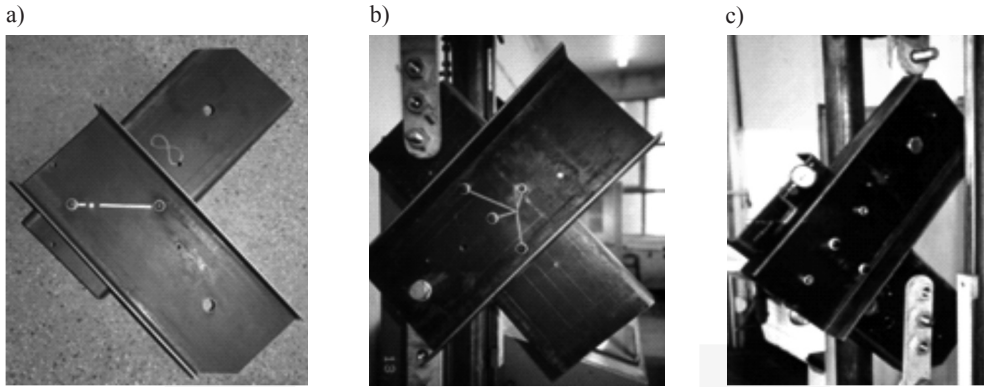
Eccentrically loaded test elements with: a) 2-bolt joint, 4-bolt joint, 5-bolt joint
